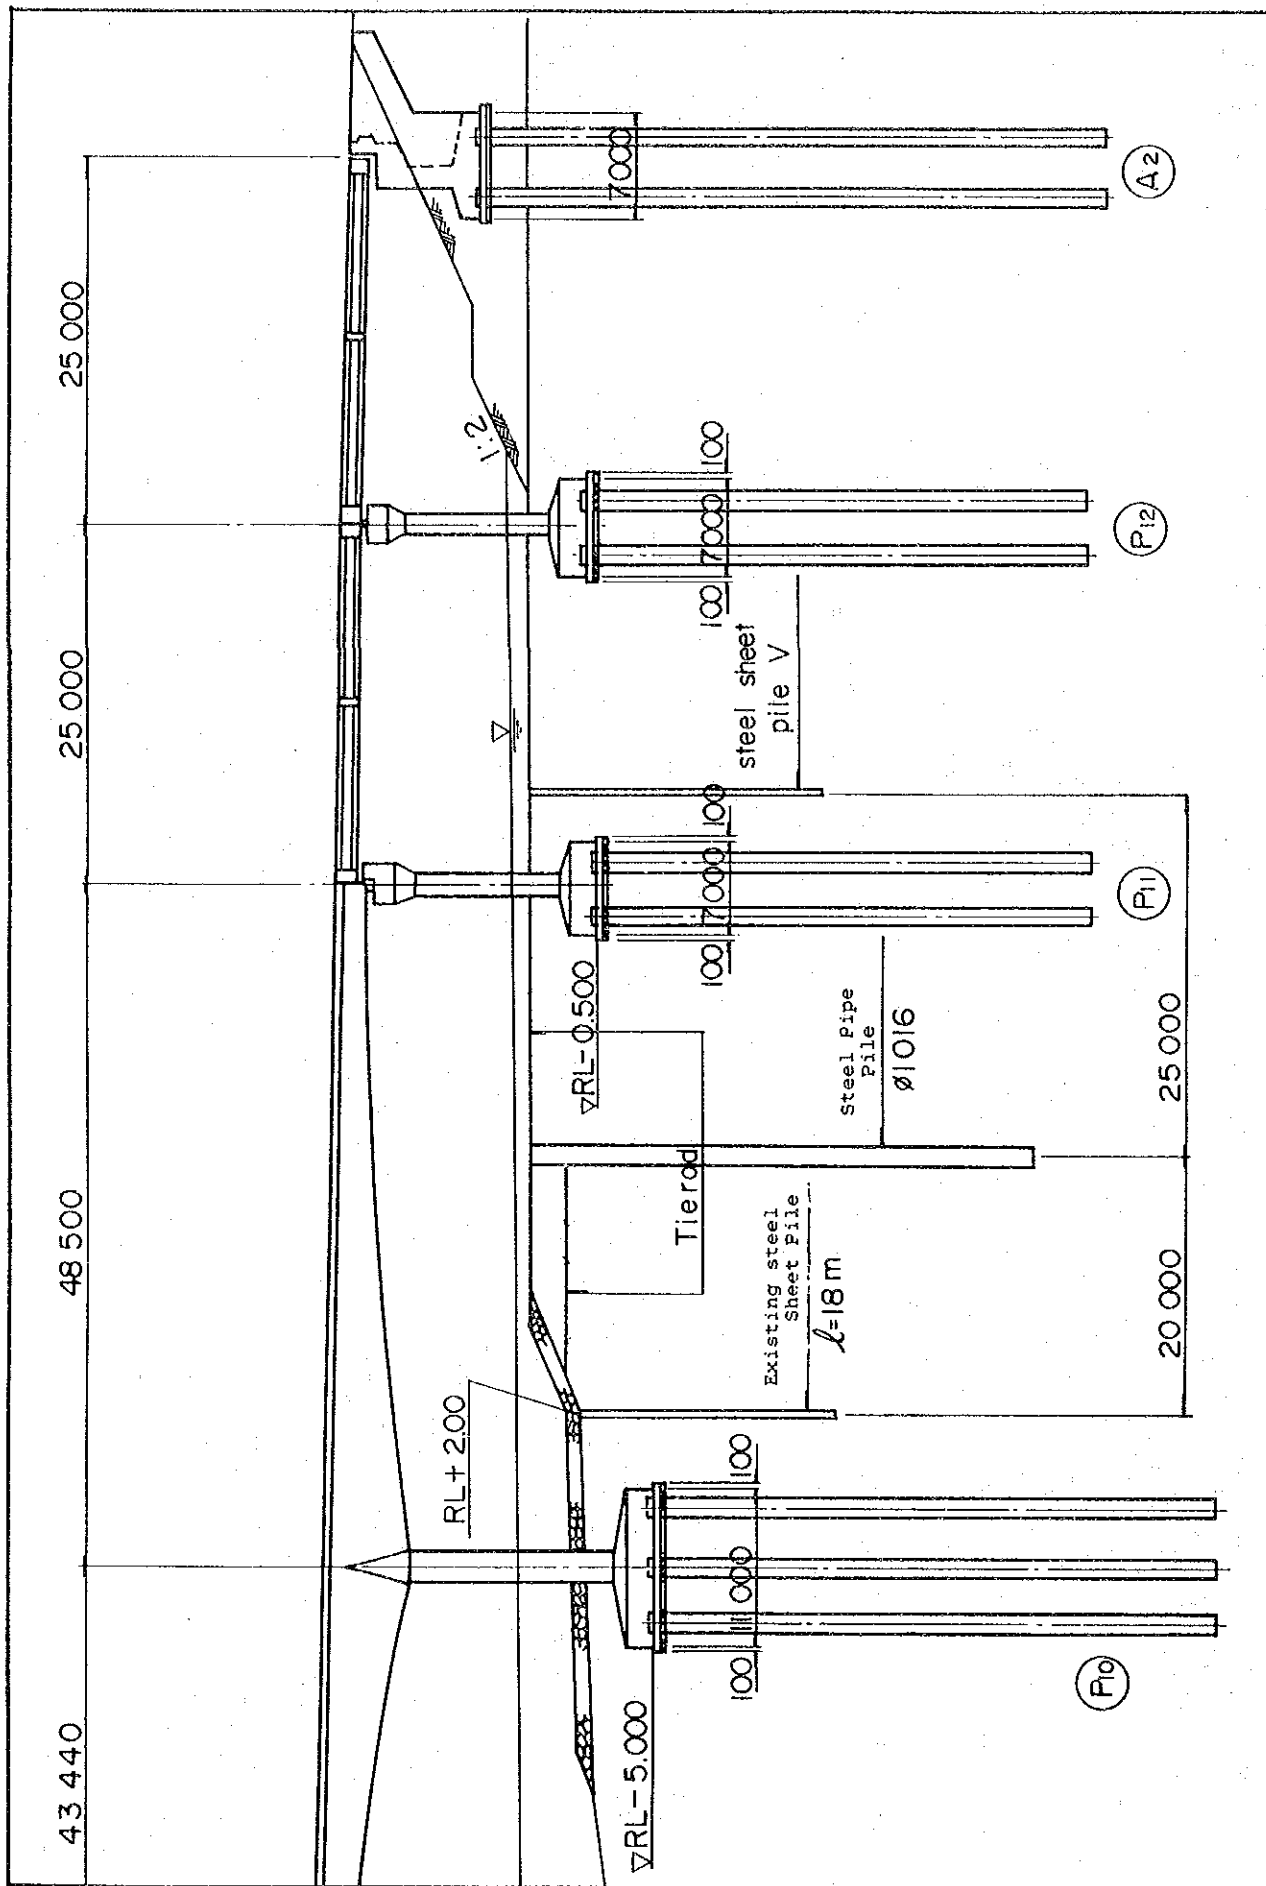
Continuous Steel pipe Piling method (TYPE 2)
